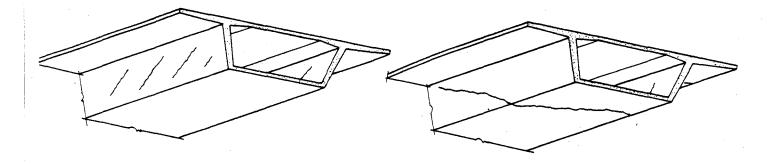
Box Girder Cracks Induced by Shear
